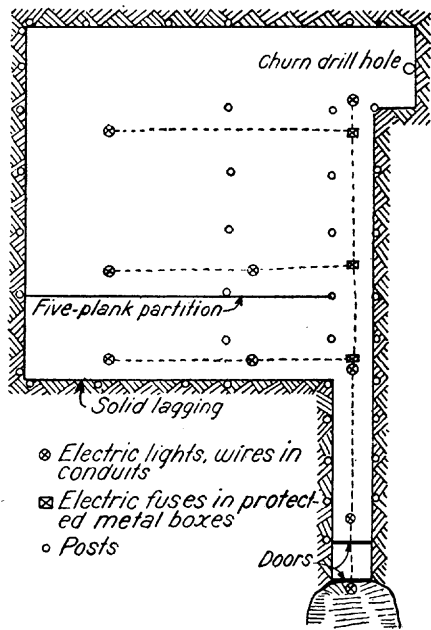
Plan of typical underground explosives magazine in Santa Rita district.
